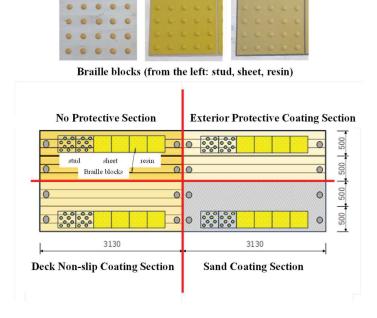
Layout of the coating and Braille blocks on the model platform surface
